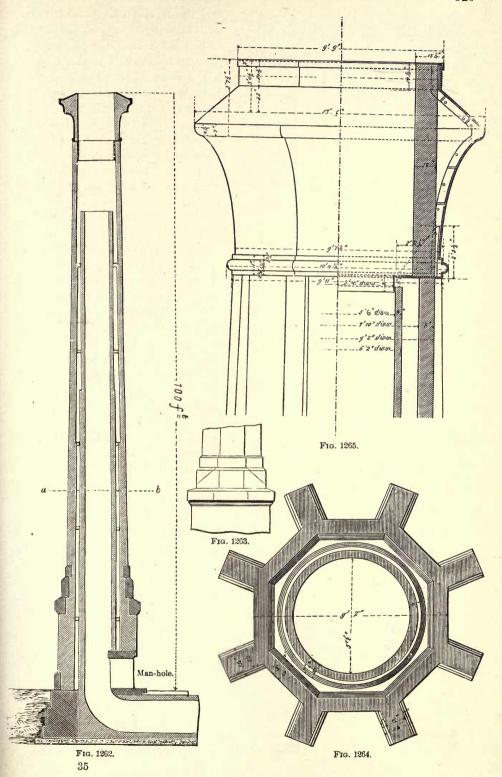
is a vertical section of a chimney at the Ridgewood Pumpingengine House, Brooklyn, N. Y., and Fig. 1263 an elevation at the point where the square base is changed into an octagonal.
